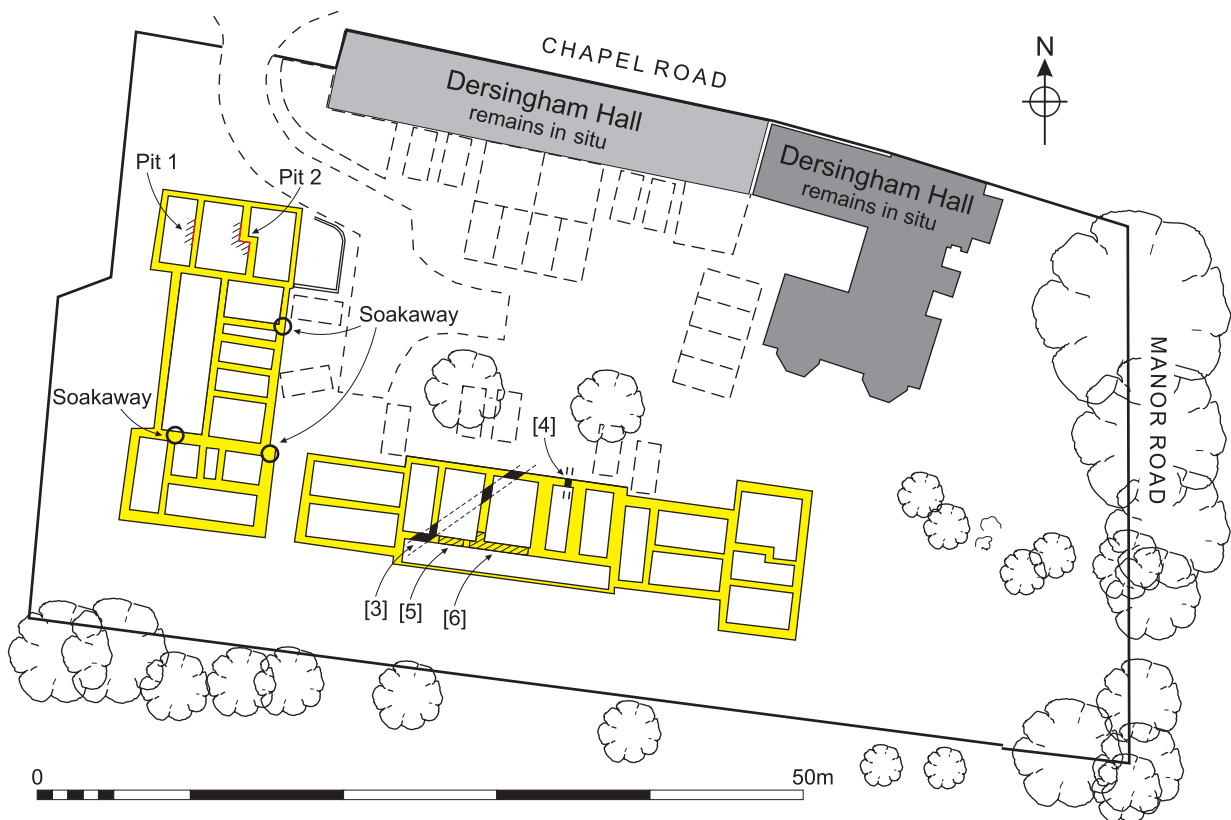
Plan of site showing location of trenches observed (shown in yellow) and features encountered. Scale 1:500
